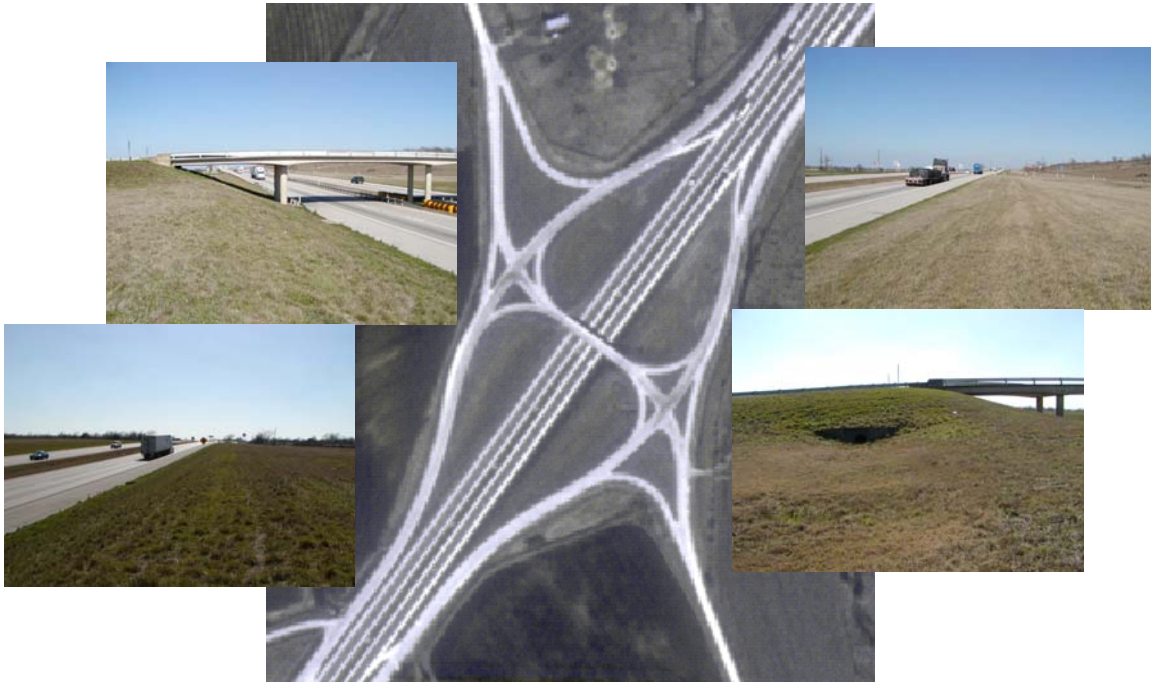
Site “A” Aerial Photo with Ground Photos Looking North and South from the NE and SW Quadrants.
